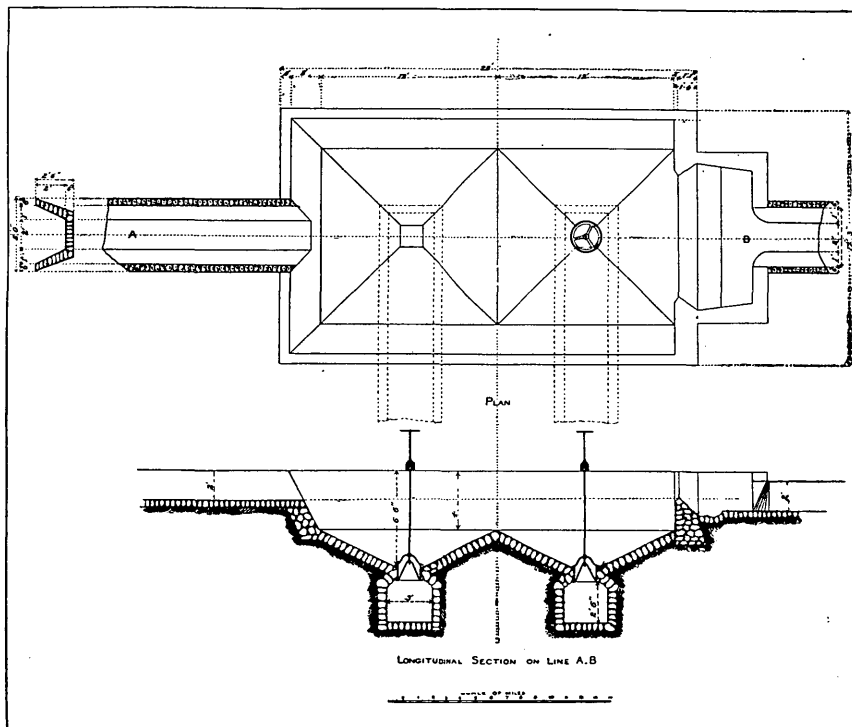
Plan and section of canal and masonry sand box of Crafton Water Company.
